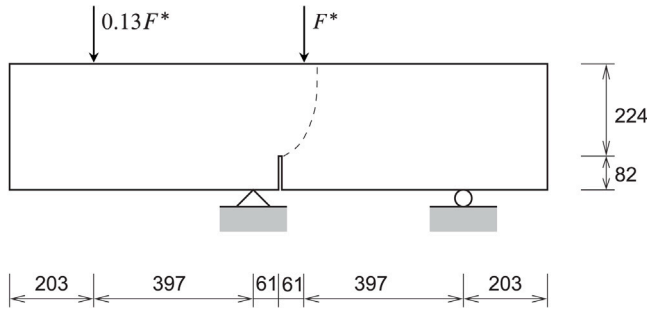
Single-edge notched concrete beam test: geometry boundary and loading conditions.
